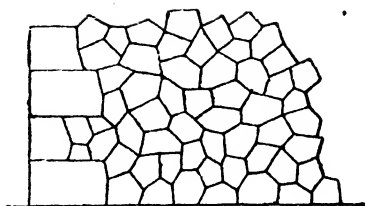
Random Rubble, with hammer-dressed joints and no spalls on face.
